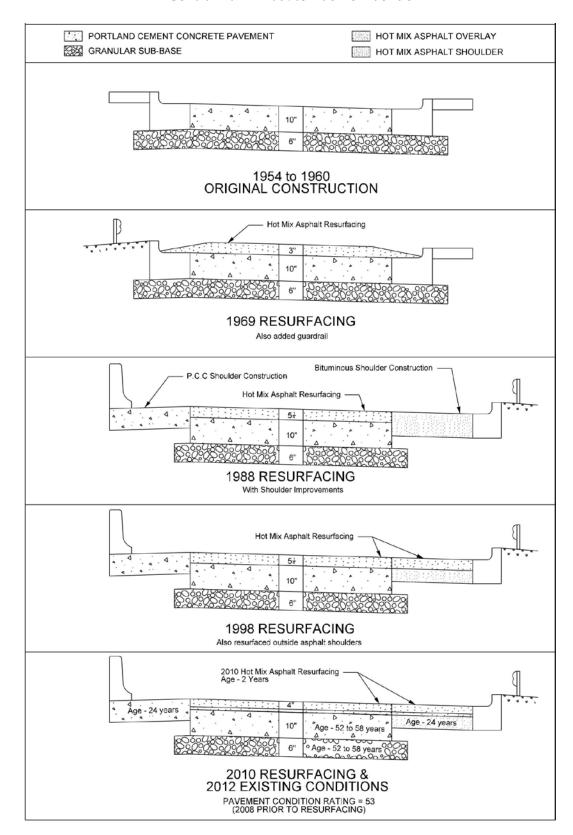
I-290 Mainline Pavement History Central Park Blvd. to Racine Avenue
